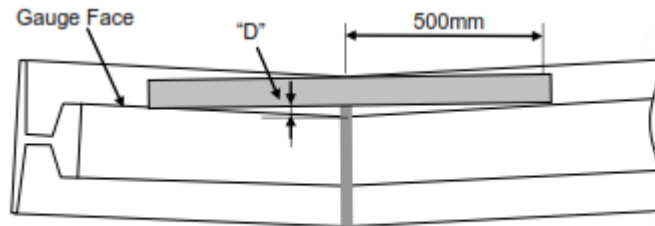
Weld misalignment tolerance in horizontal plane (widening)
